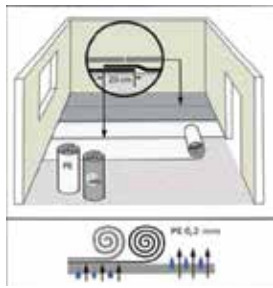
Never overlap underlay edges. Joins should be taped with an adhesive tape. When planning the installation remember to not place a join in the product within 20 cm of a join in the underlay.
